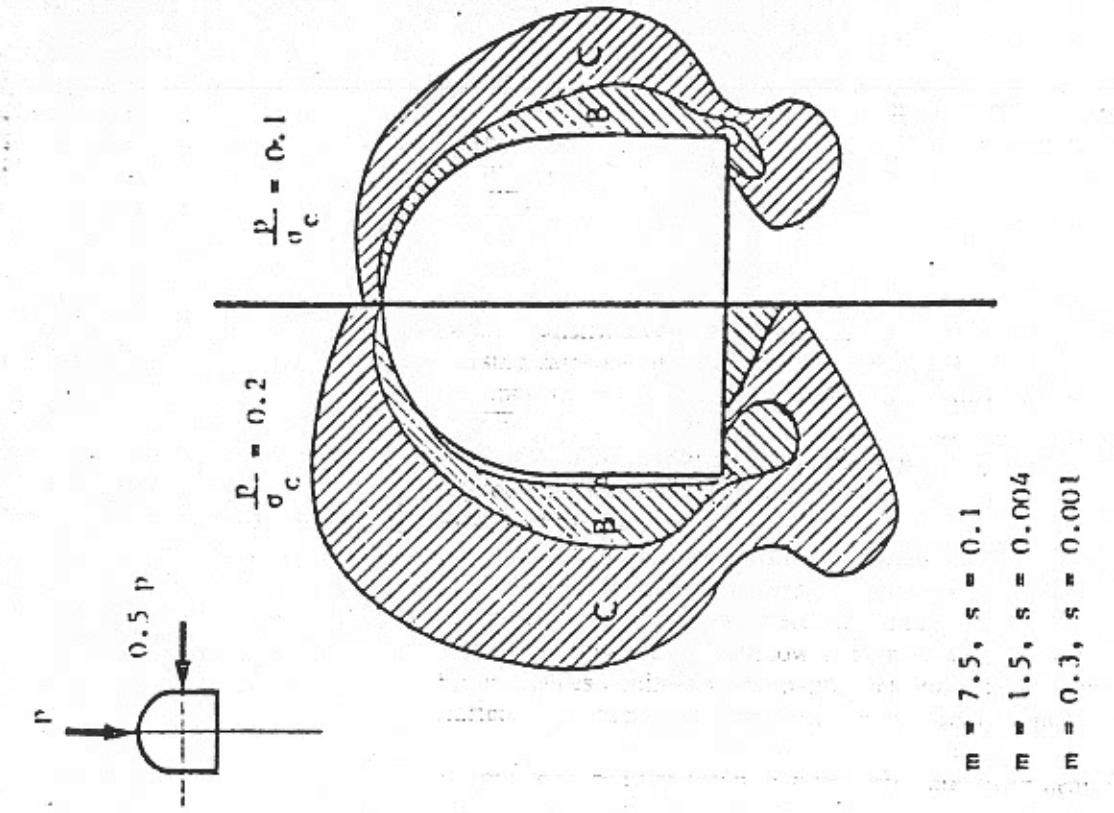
POTENTIAL OVERSTRESSED ZONES AROUND A HORSHOE OPENING
